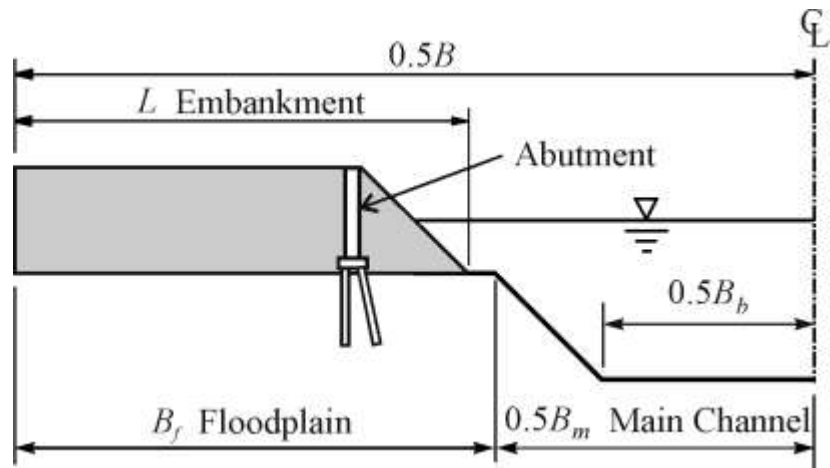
A definition sketch showing embankment length extending to the abutment, floodplain width, and main-channel width
